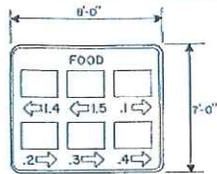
TYPICAL EXIT RAMP BACKGROUND SIGN PANEL DETAIL
